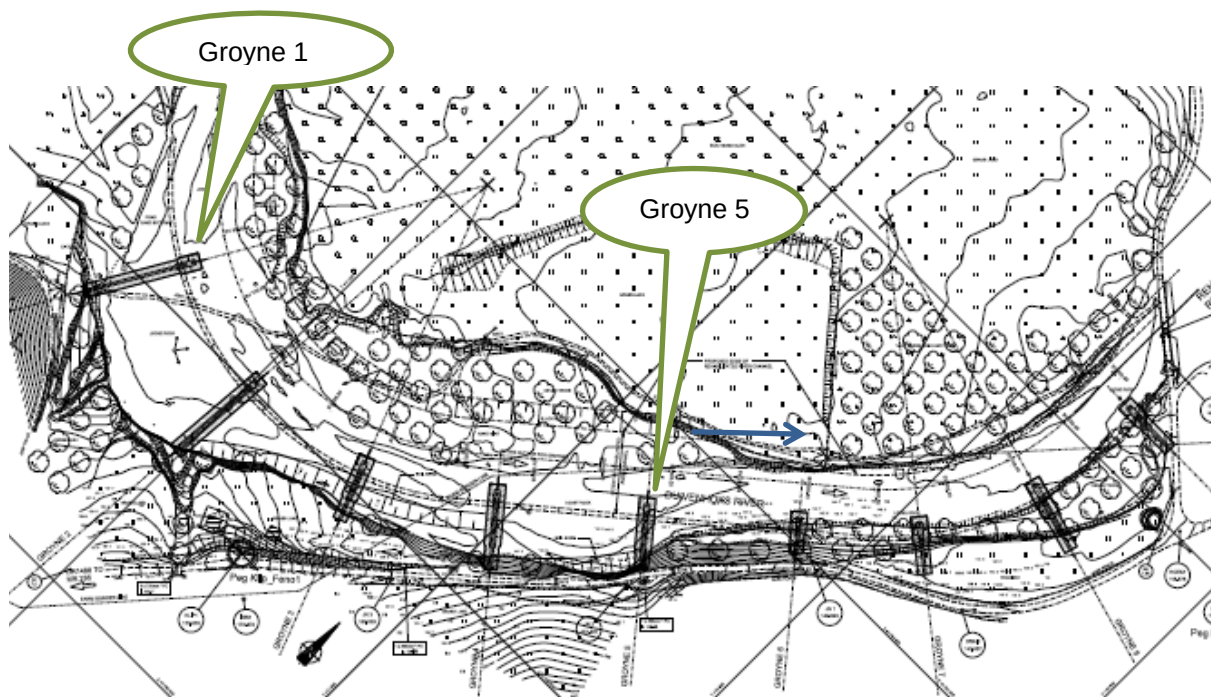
Portion of layout plan Klipdrift project (Bergstan South Africa; Department of Agriculture)
